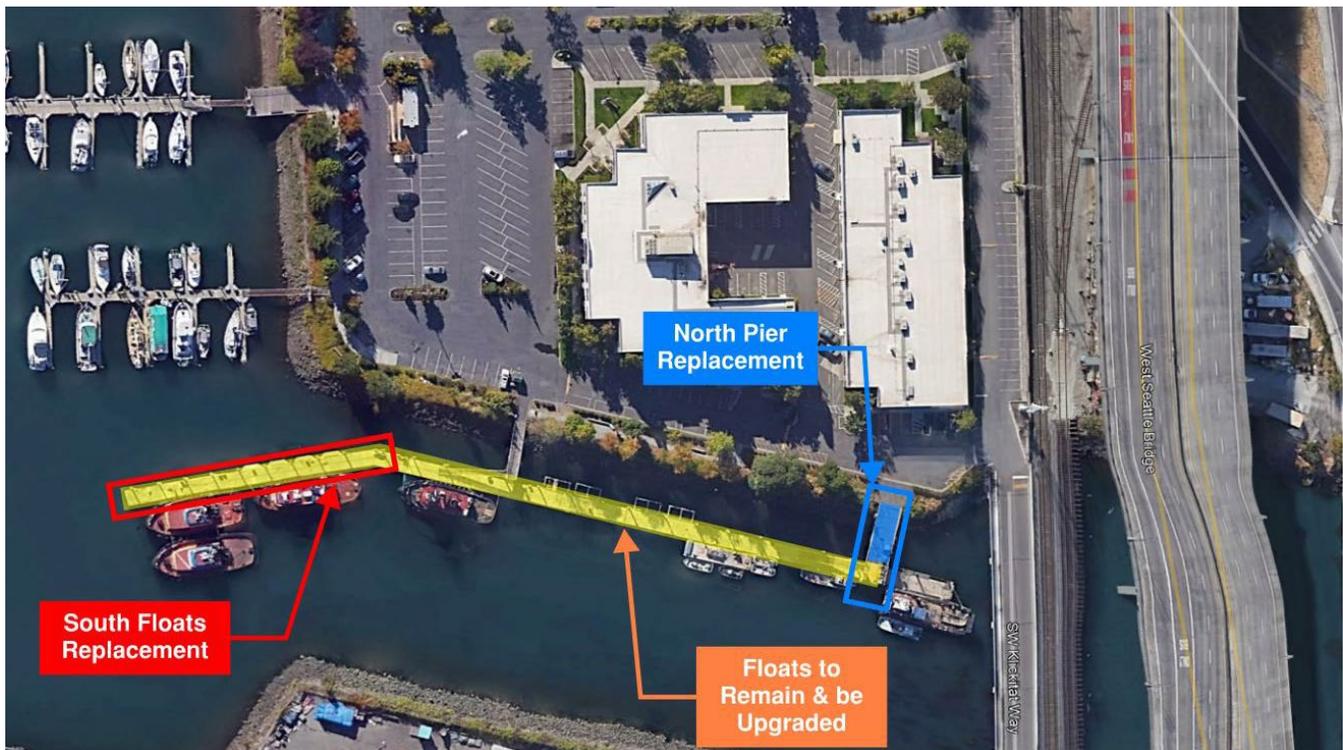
Harbor Island Marina Dock E Float and North Pier Improvements Project Elements
